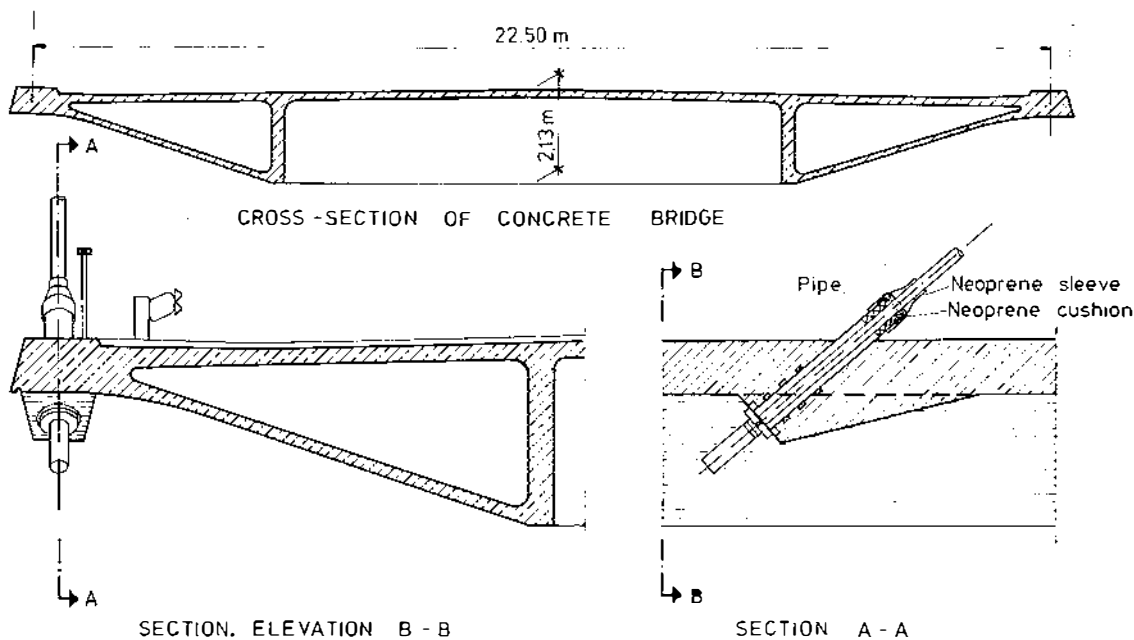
Pasco-Kennewick Intercity Bridge, cross section and anchorage of stay cables. (Courtesy of Fritz Leonhardt.)
